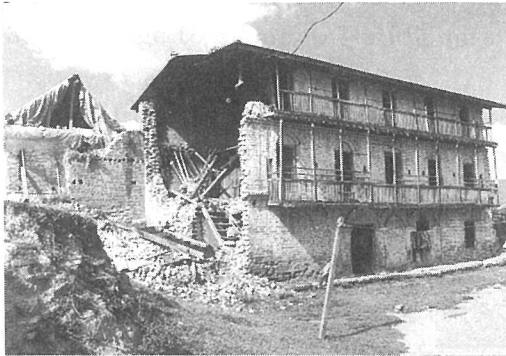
Damage to the gable wall of a brick masonry building; example 1, Dhankuta Bazaar, Nepal
